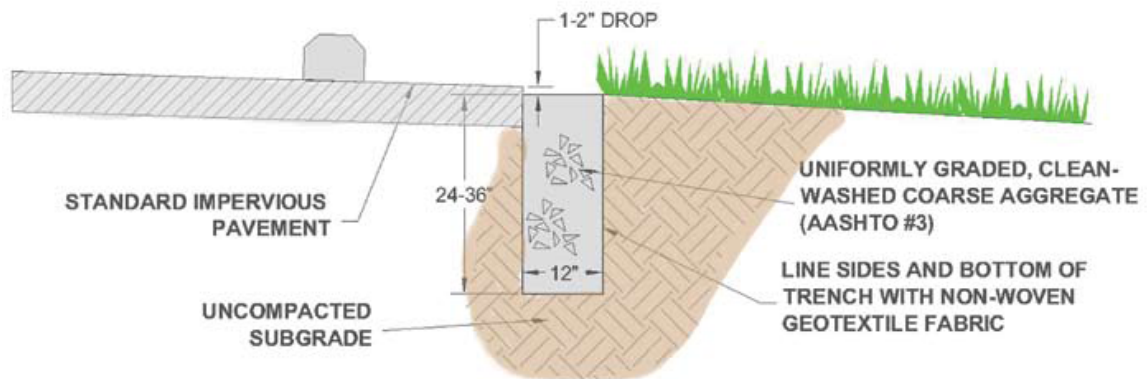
Level spreader adjacent to roadway or parking lot (SEMCOG 2008)
